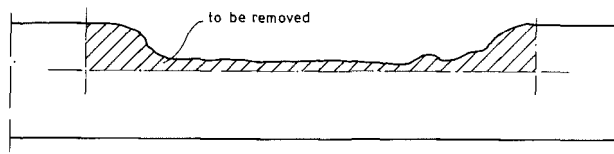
A severely deteriorated surface of an asphaltic concrete revetment to be fraized.
